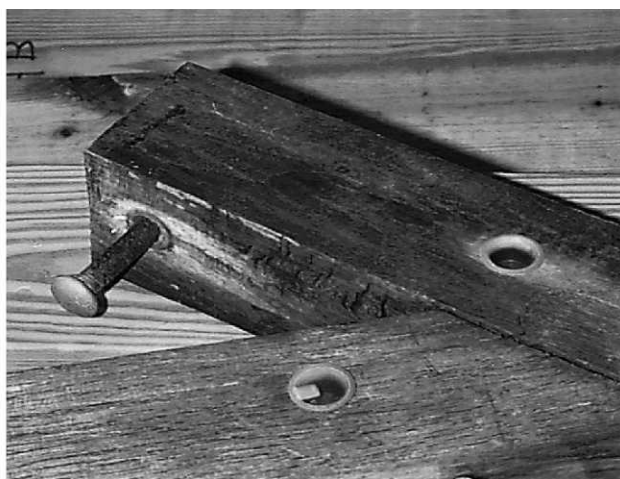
Typical failed untreated pole stub after 41 months in service in American Wood-Preservers' Association Hazard Zone 4.
